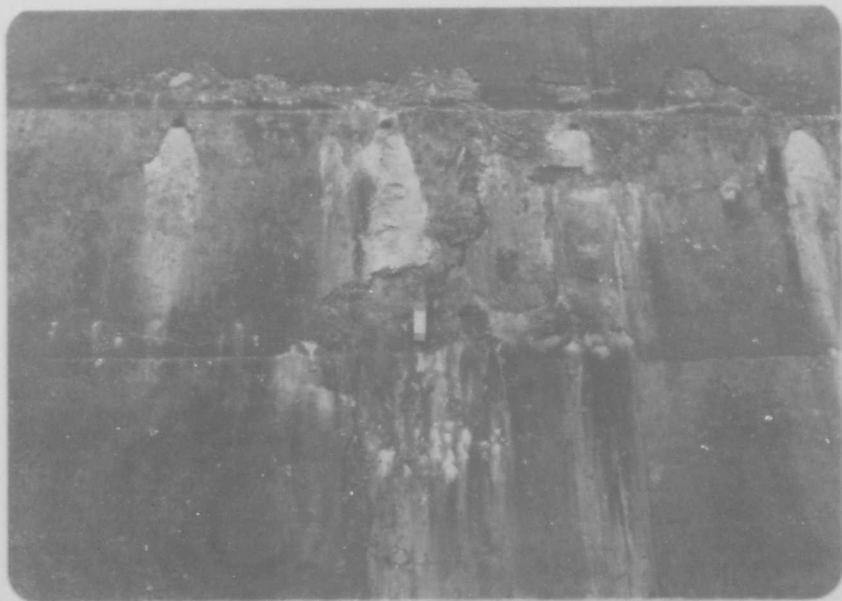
Holes cored in concrete dam-purpose unknown.
